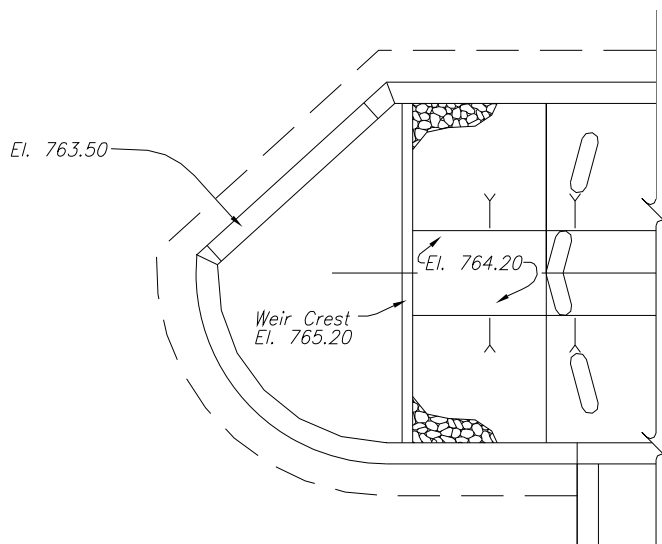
Plan view showing fishway exit weir and weir added at upstream end of fishway chute.
